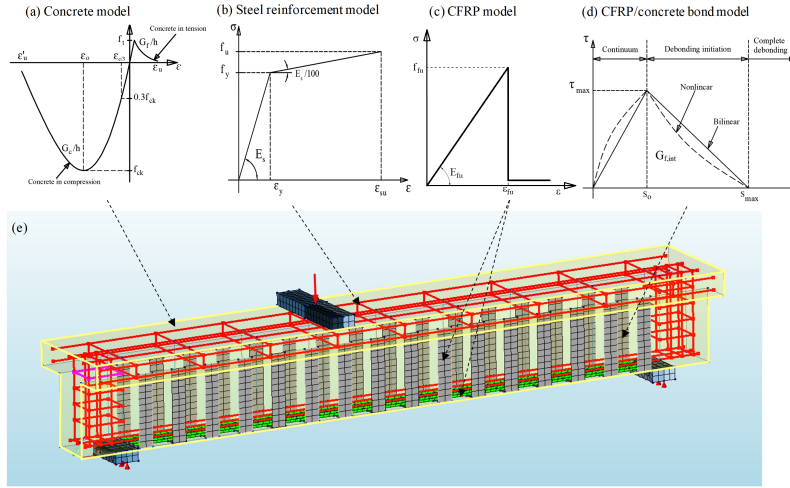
Finite element model of the strengthened T-beam: (a) Concrete under tension and compression; (b) Steel reinforcement; (c) NSM CFRP strips and EXB CFRP sheets; (d) Bond-slip of CFRP/concrete interface
